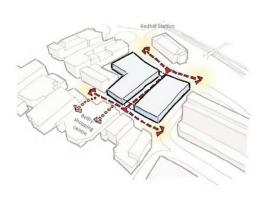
Marketfield Way Redhill - A mixed-use development providing new multi-screen cinema and flexible retail, restaurant and café units on ground floor with residential apartments above, granted under planning permission 16/01066/F. Buildings comprising part five, part six, part ten and part thirteen storeys with accompanying car parking and cycle storage, offer a dual frontage, facing onto both High Street and Marketfield Way with central break providing pedestrian access vial a partially covered colonnade, helping to better connect and link the train station and south end of the High Street. The design and materials of the cinema and residential elements are quite different, intentionally so, to reflect their contrasting uses.
